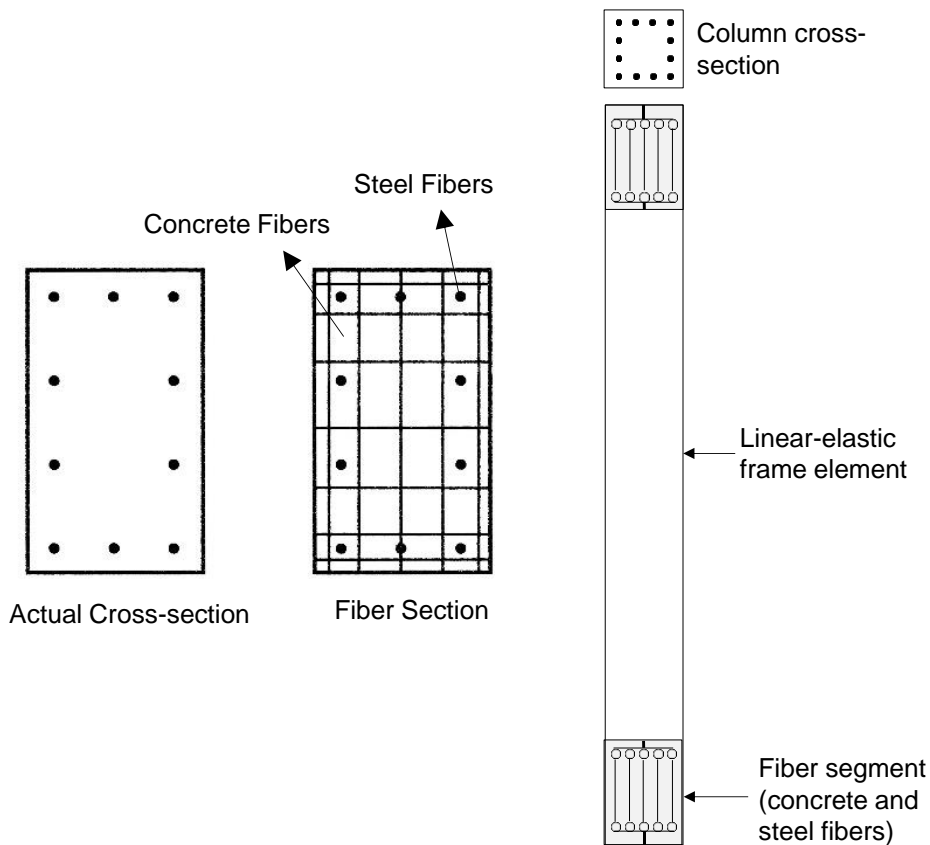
Fiber section of a reinforced concrete column, cross-sectional view (left), side elevation (right) [Modified from Powell (2010)]
